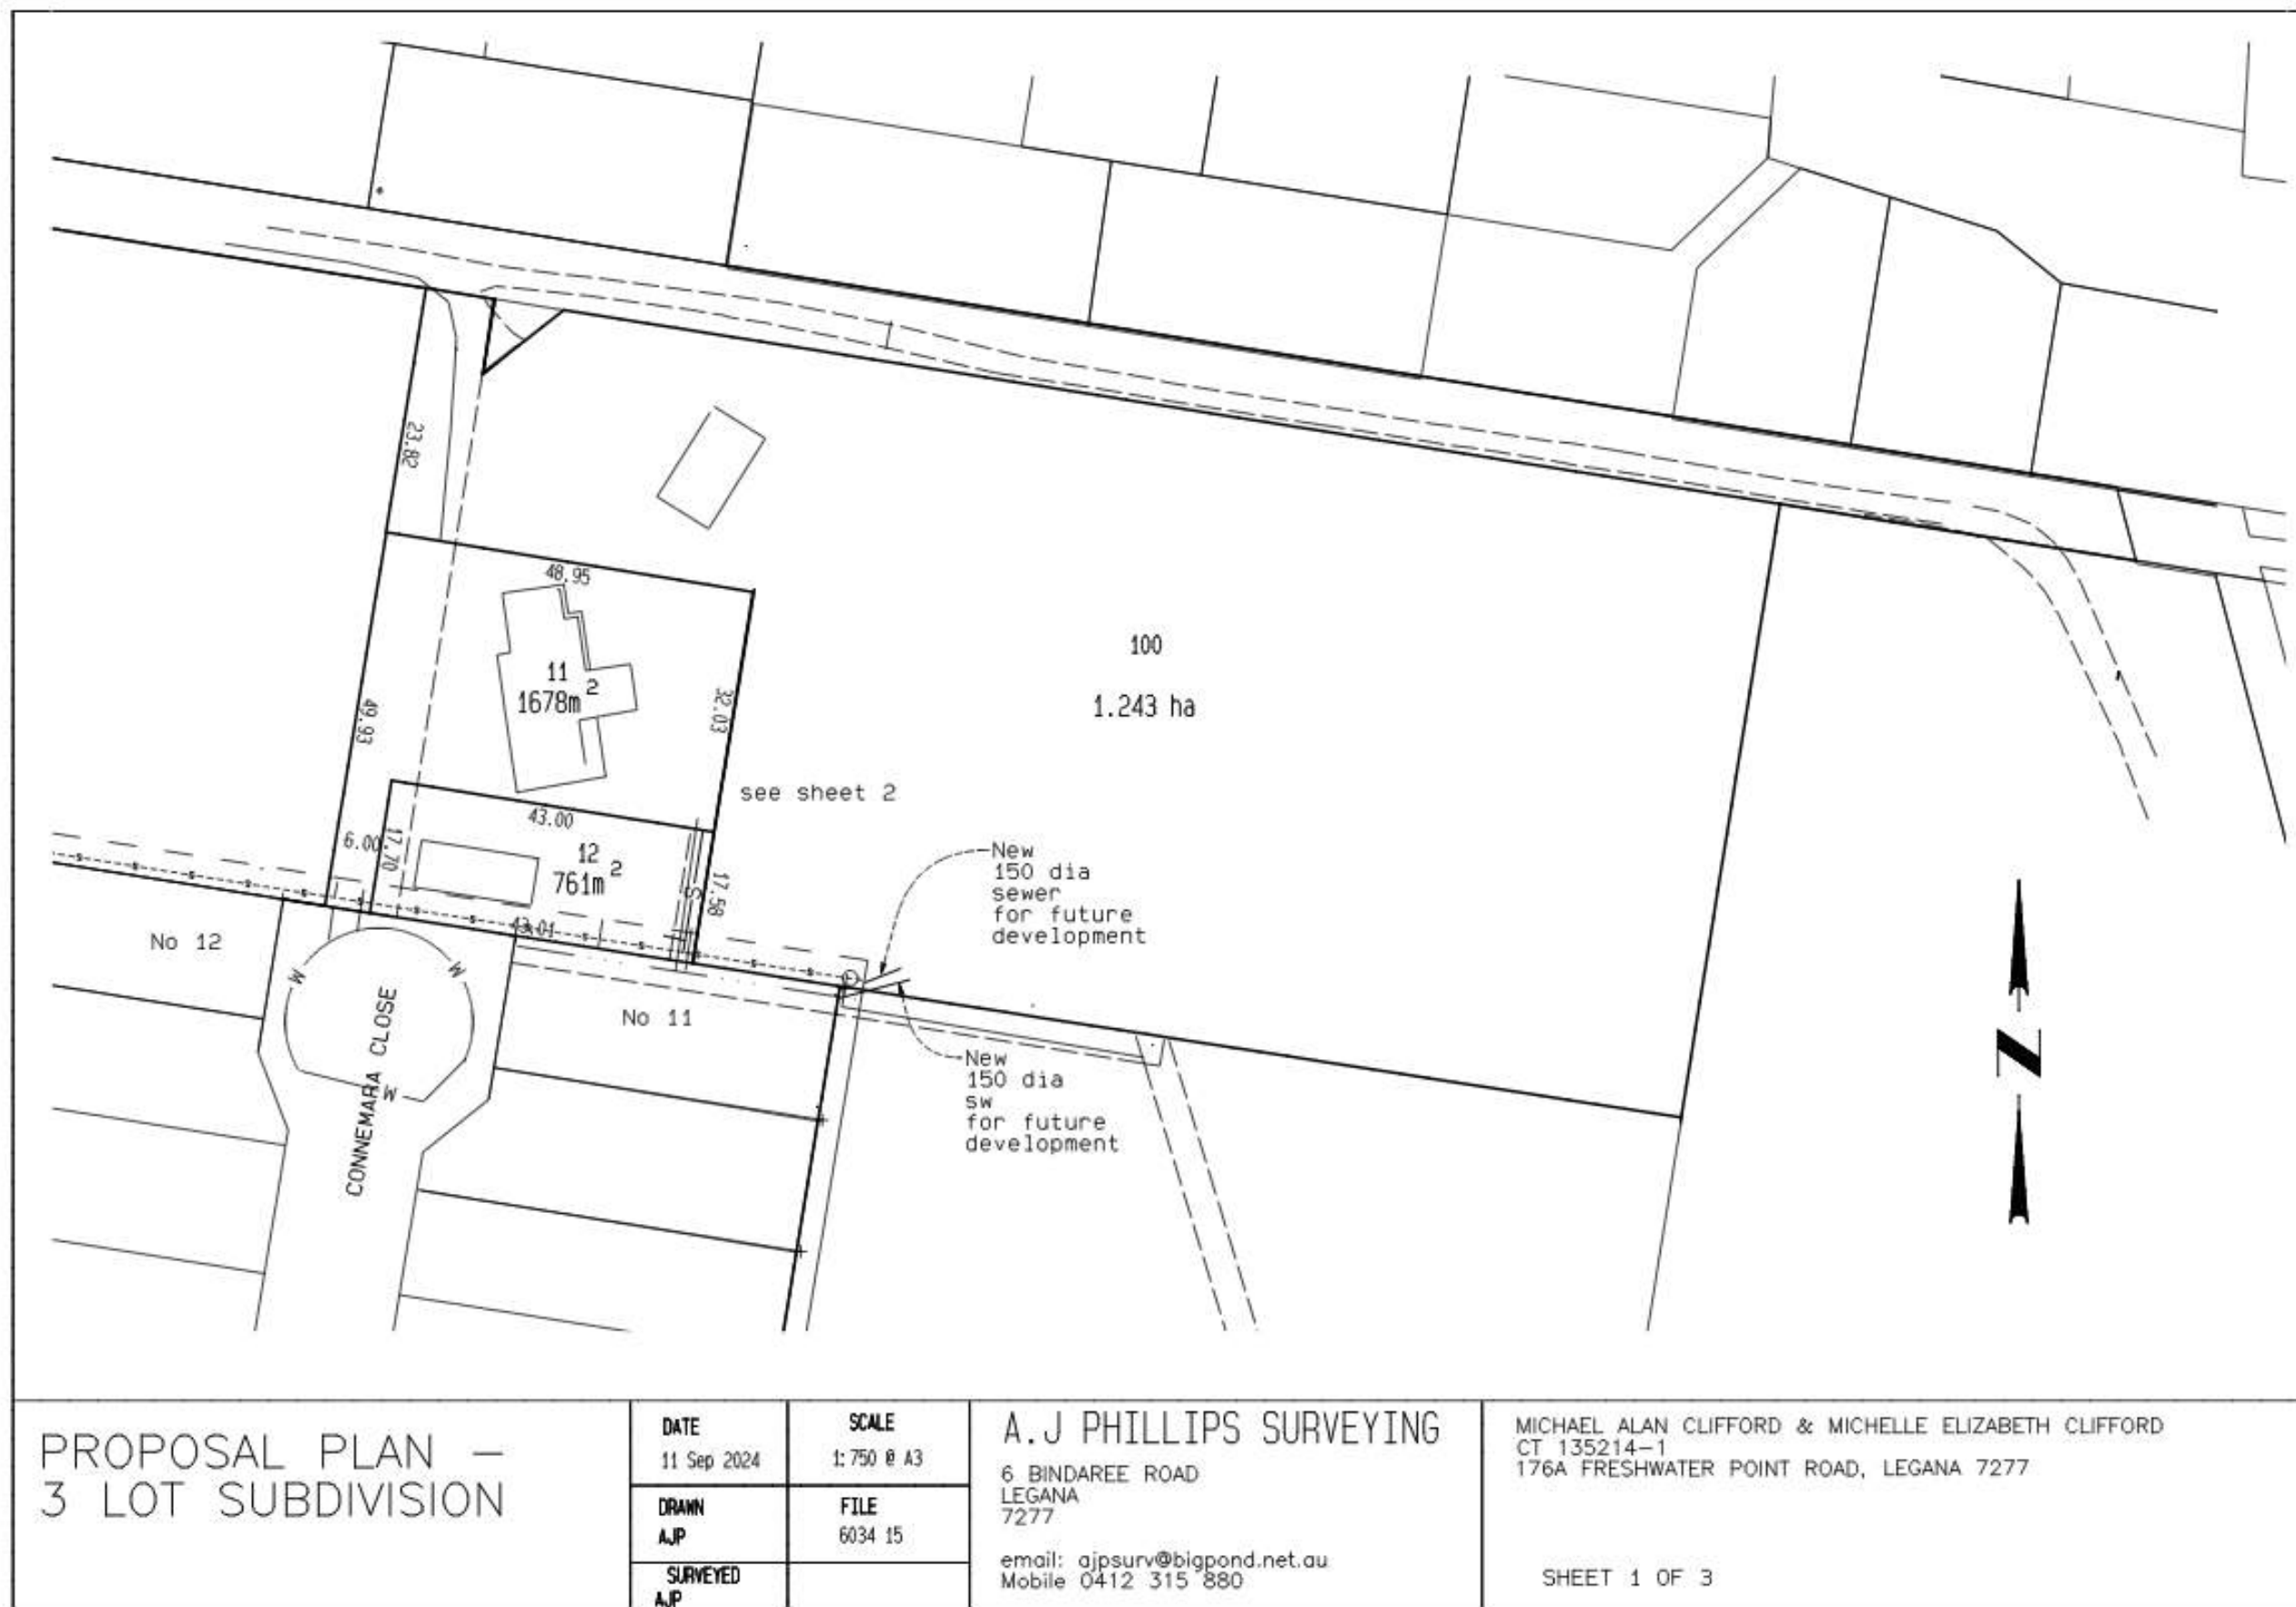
Site plan for approved subdivision (PA2023277), Lot 100 is the subject site for the proposed 10-lot subdivision
